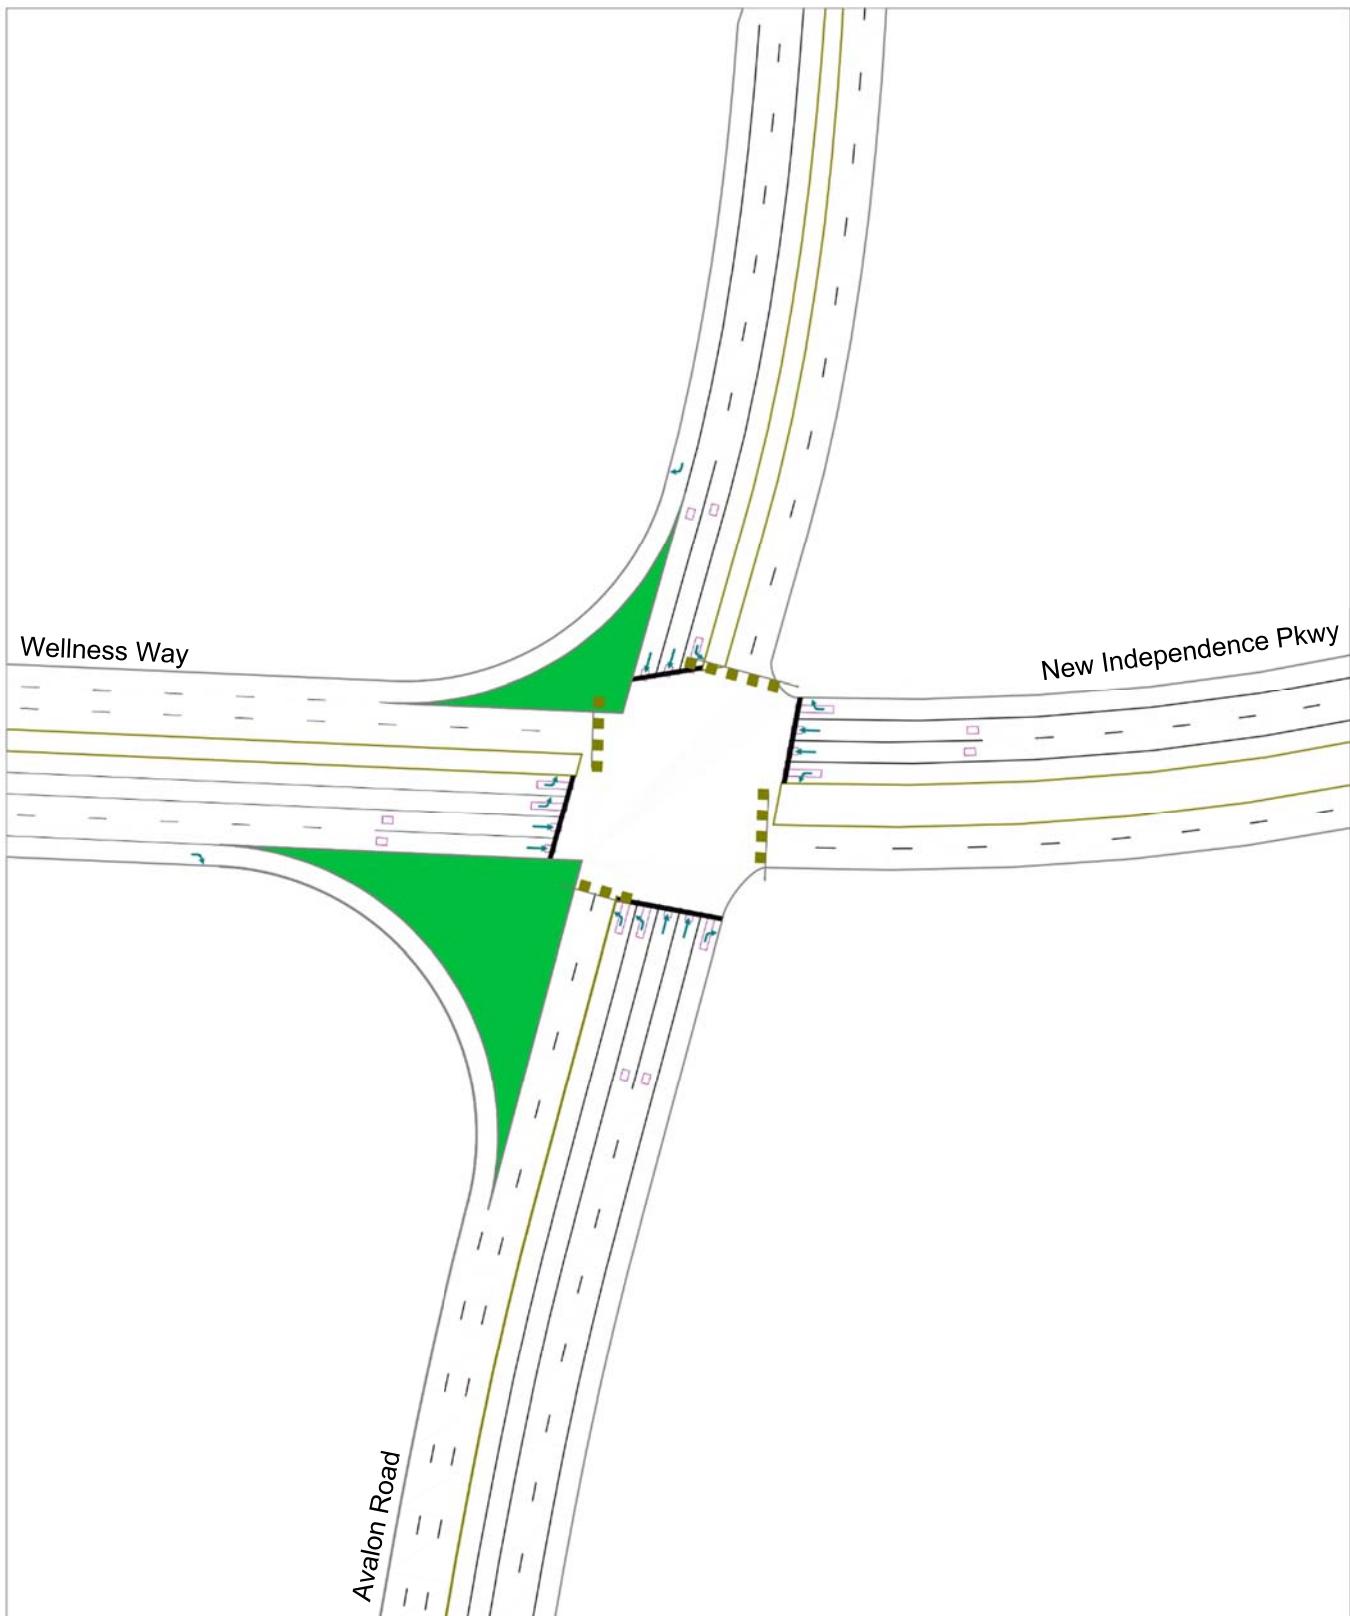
Wellness Way & Avalon Road – Alternative 1.3
